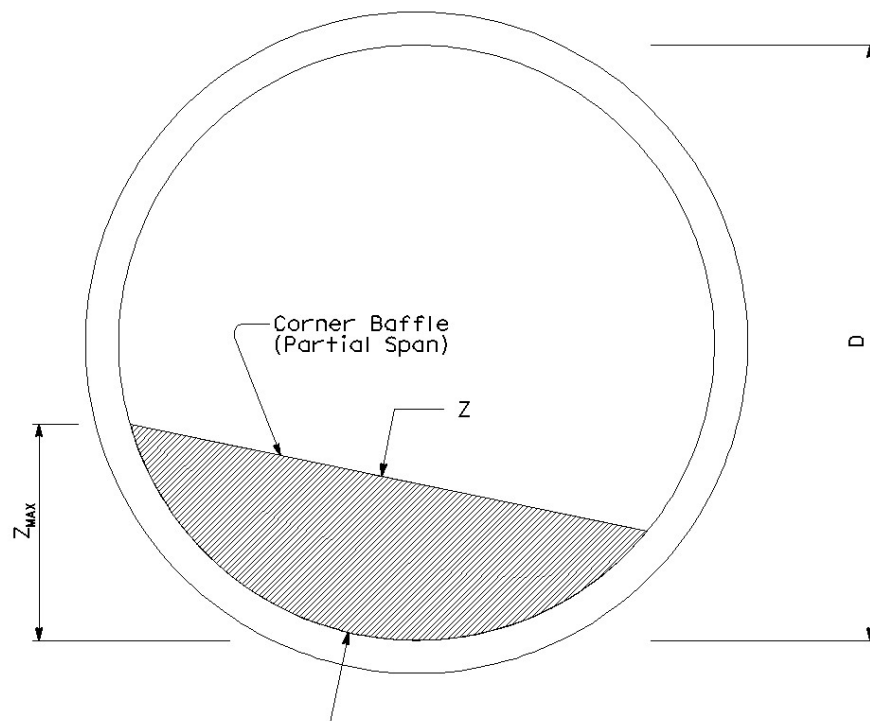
Corner Baffle Cross Section For Circular Culverts
